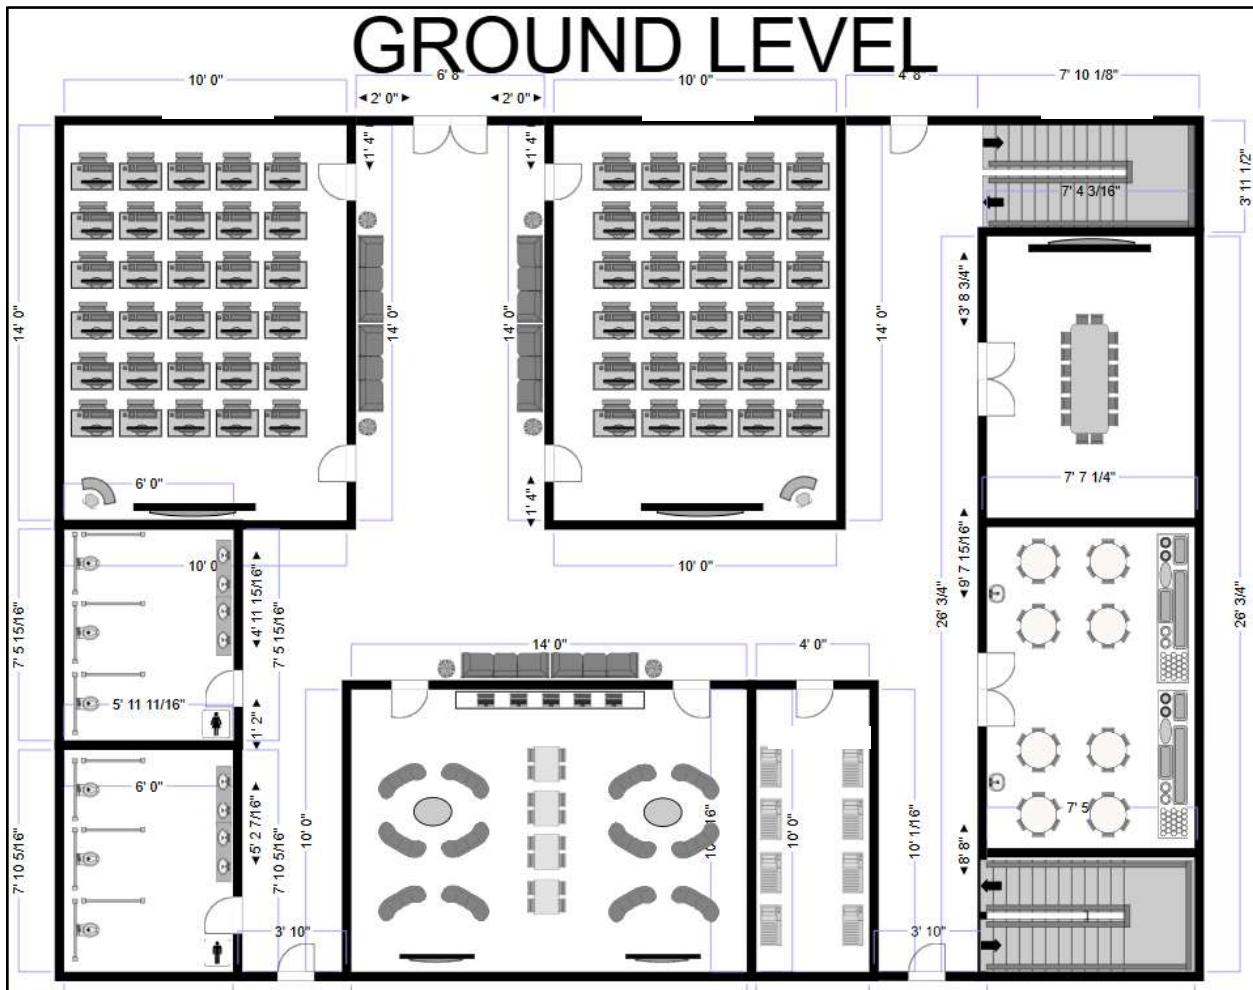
Floor Plan for Ground Floor (GF) of Block N28B
